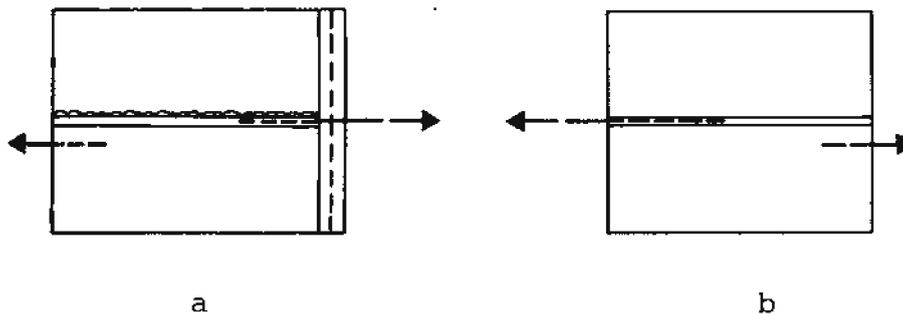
Severe conditions where the anchorage capacity in the longitudinal joint still remained
